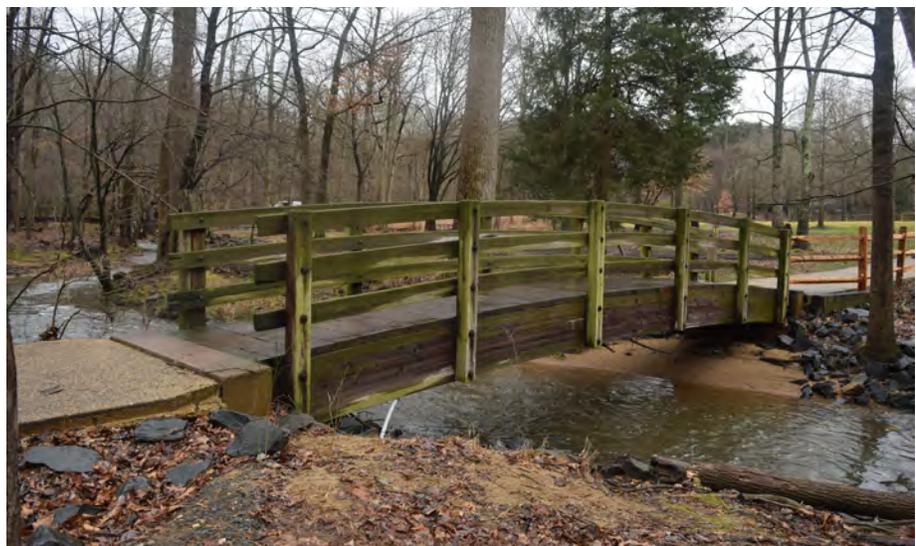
Northern bridge over Wolftrap Creek, facing southwest (QE, 2020).
